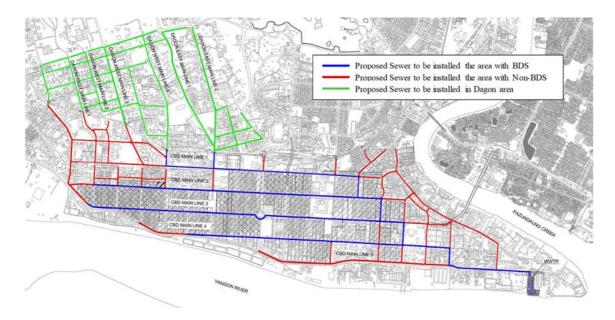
Trunk Sewer Alignment in Dagon Area
